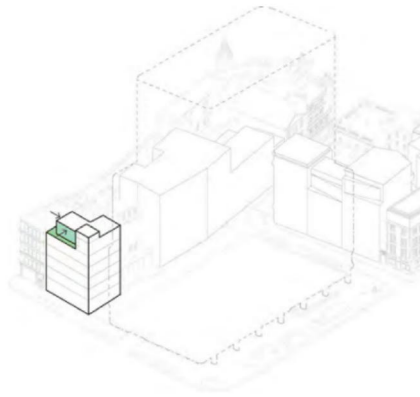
Fifth floor plan of the site showing roof terrace in context with The Cuban Embassy
